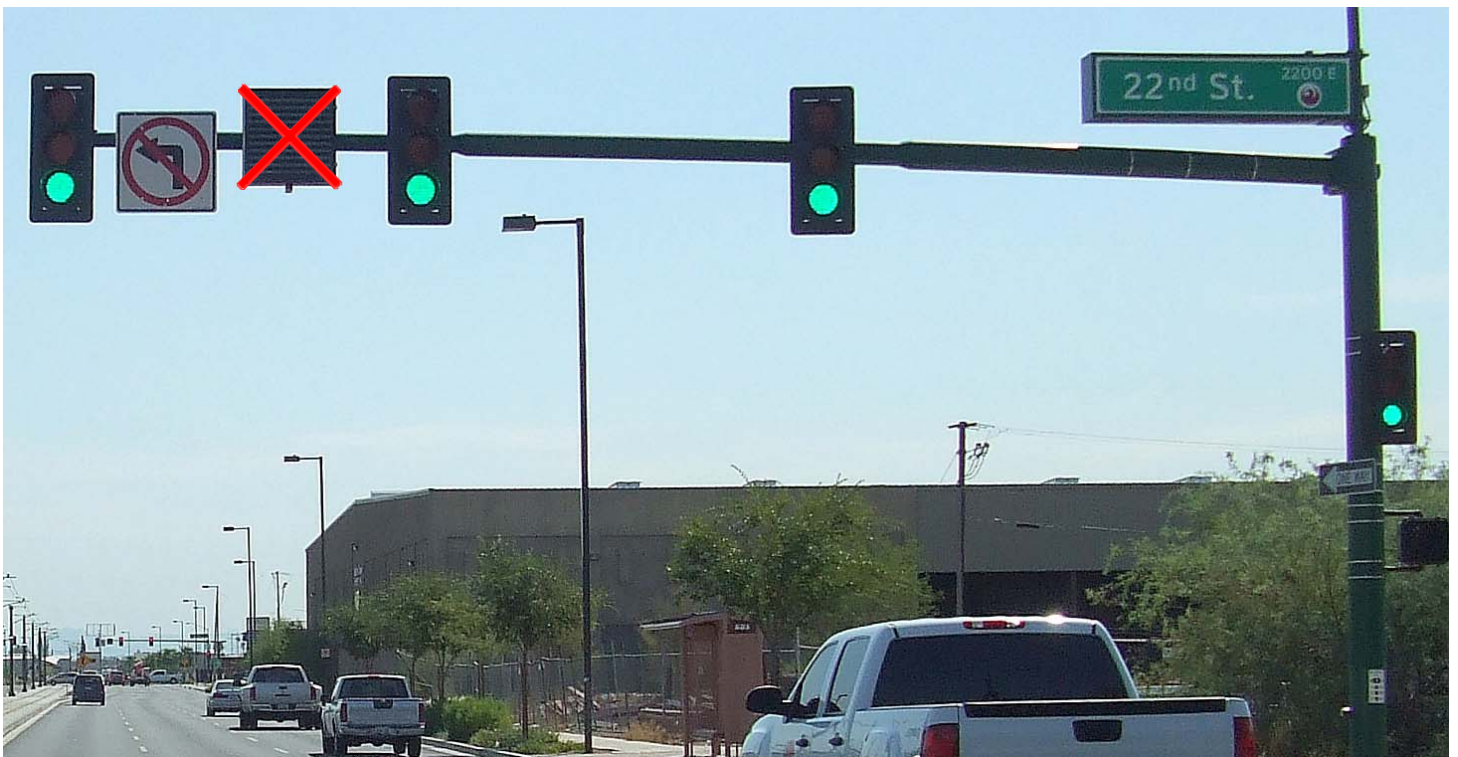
22<sup>nd</sup> Street and Jefferson Street – Recommendation
